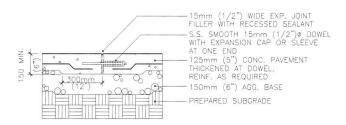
Concrete paving expansion joint with thickened edge. Used when vehicular loading may require extra support.
